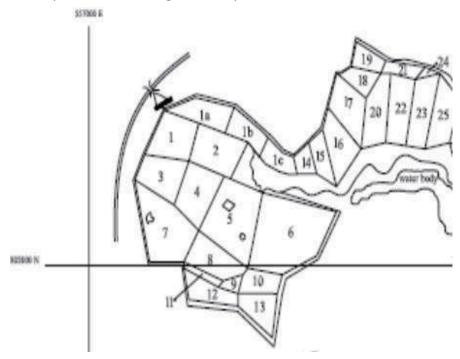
An example of designing divided canals type, Baniekrom-C site.Source: SRI
